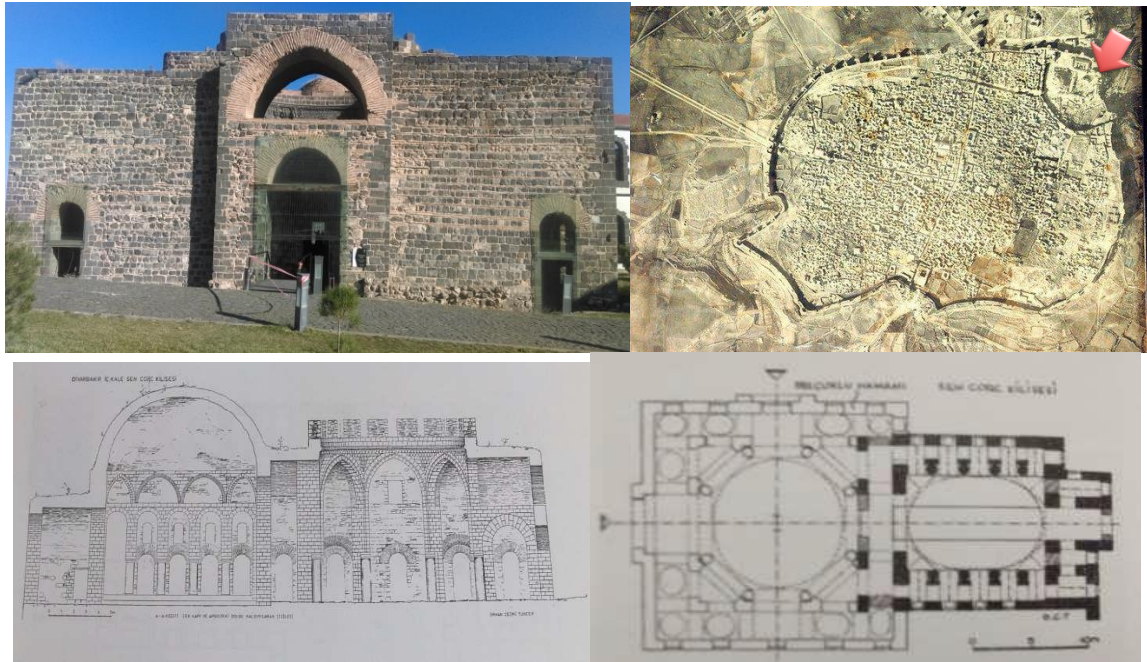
Saint George Church front view (top-left); its location in the city wall (top-right) and the church section and its plan [2].
